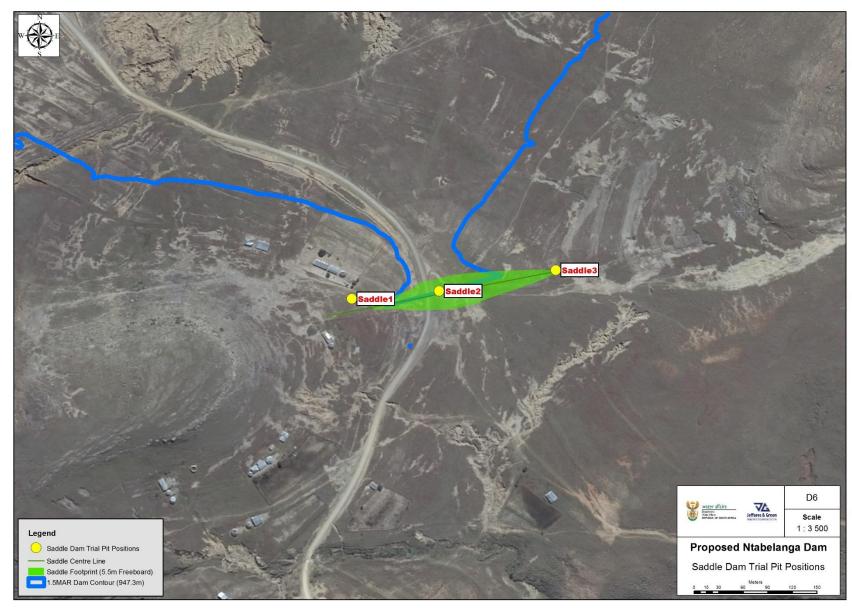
Possible Saddle Dam and Trial Pit Positions
